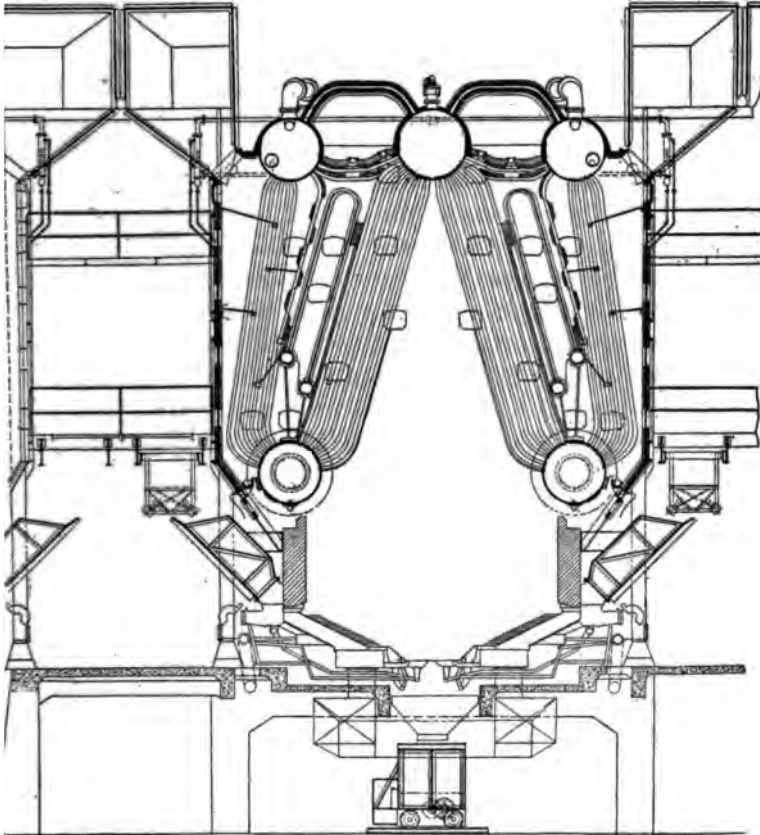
SECTION OF STIRLING BOILER, SHOWING FURNACE AND STOKER
